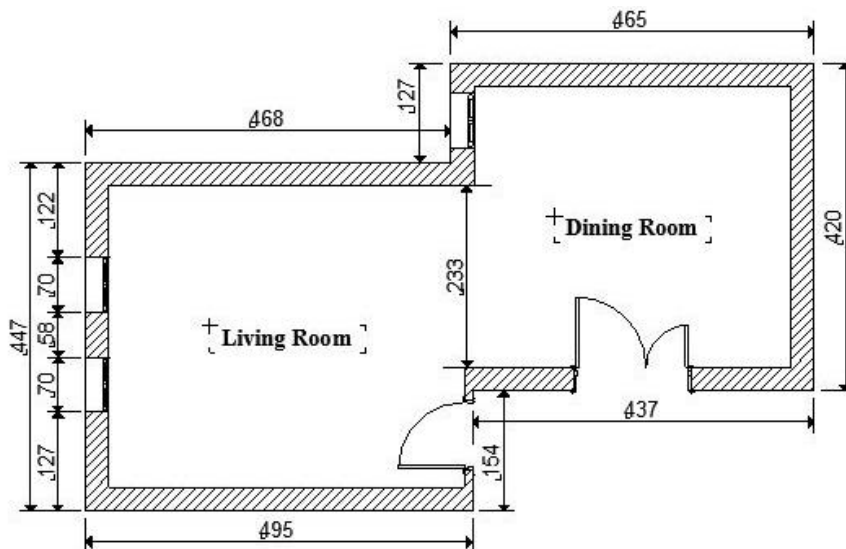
Detailed plan and dimensions (cm) of the study key space (living and dining room)
